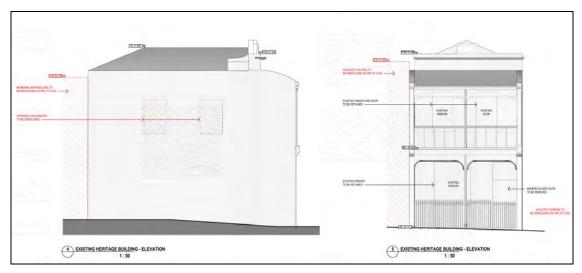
Elevations of 166-170 Bouverie Street showing proposed alterations
